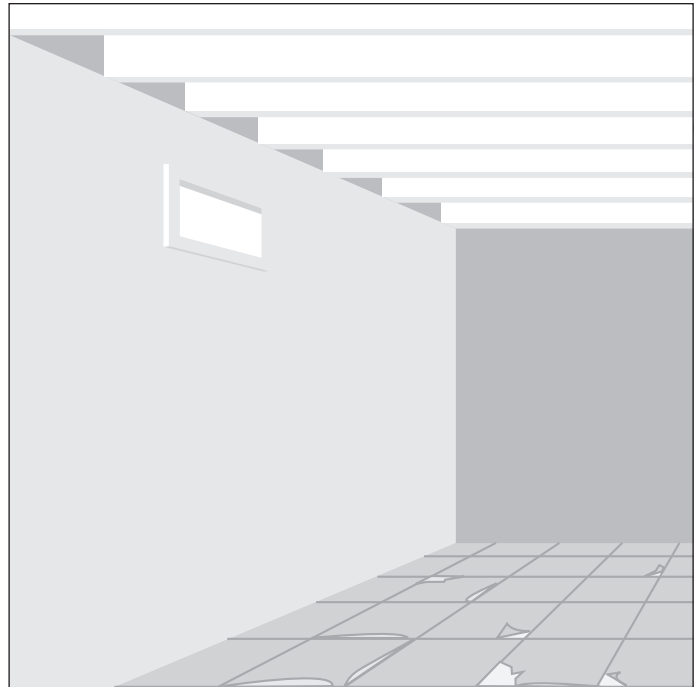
Uplift of floor tiles or buckling of wood subfloor
